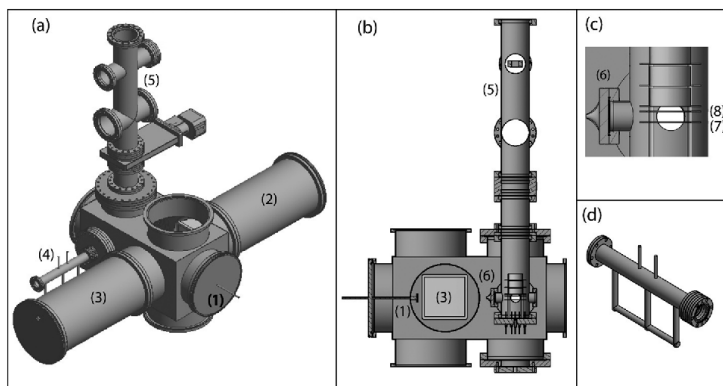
(a) Assembly drawing of the combined CP-FTMW/TOFMS vacuum chamber in a 3D rendering, (b) a side-on cross-sectional view, (c) an enlarged view of the skimmer and Wiley-McLaren extraction region, and (d) a close-up of the VUV cell. Labeled components: (1) pulsed valve, (2) broad-casting horn, (3) receiving horn, (4) VUV cell, (5) TOF tube, (6) skimmer, (7) repeller plate, and (8) draw-out-grid.
